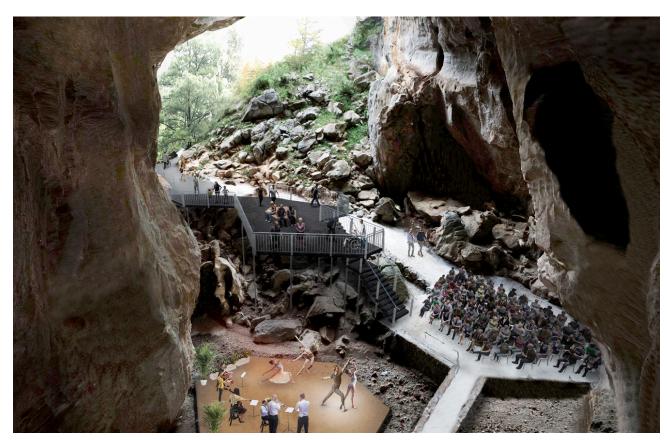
View south towards the proposed Arch viewing deck illustrating event mode
